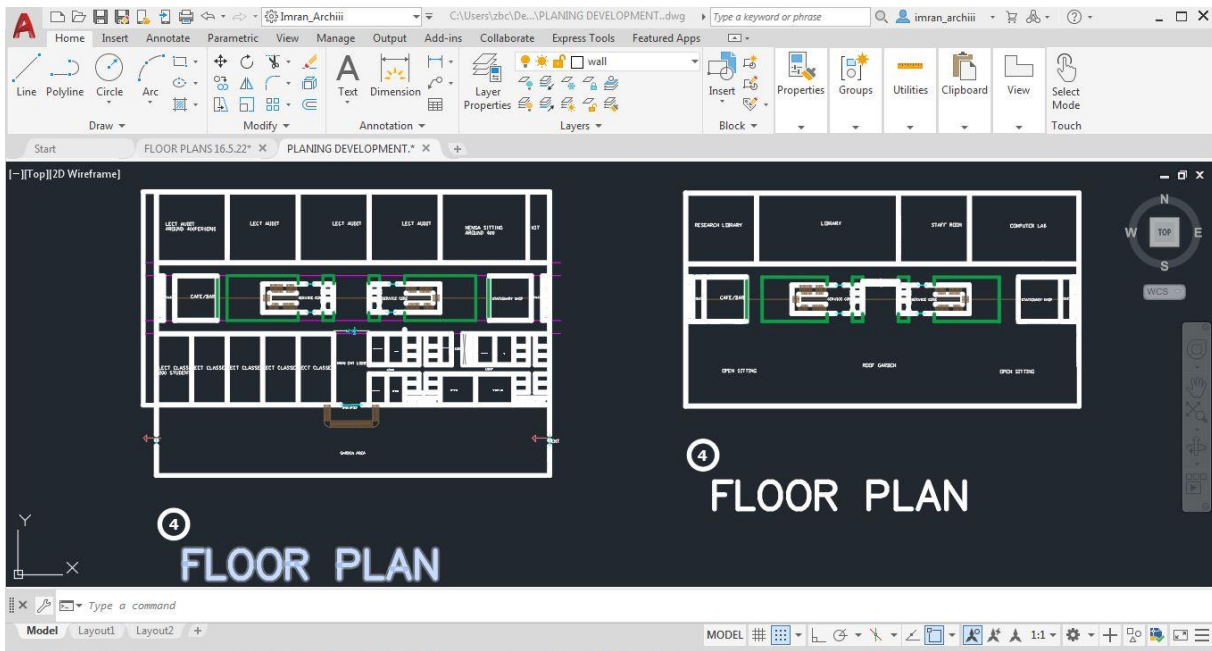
Layout stage-1, in Autodesk AutoCAD 2020 [55]
